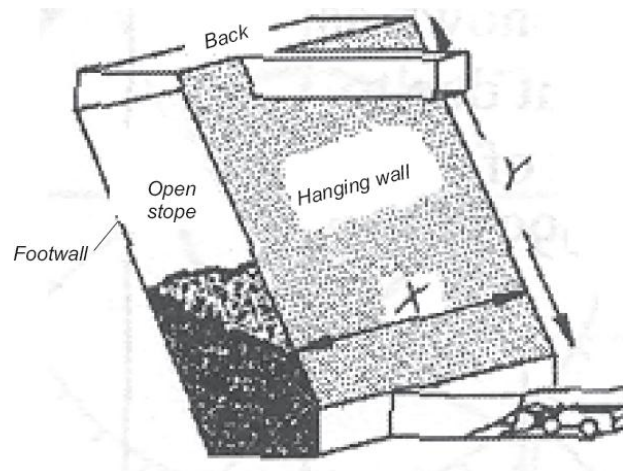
Hydraulic Radius of a Hangingwall (Laubscher, 1994)
